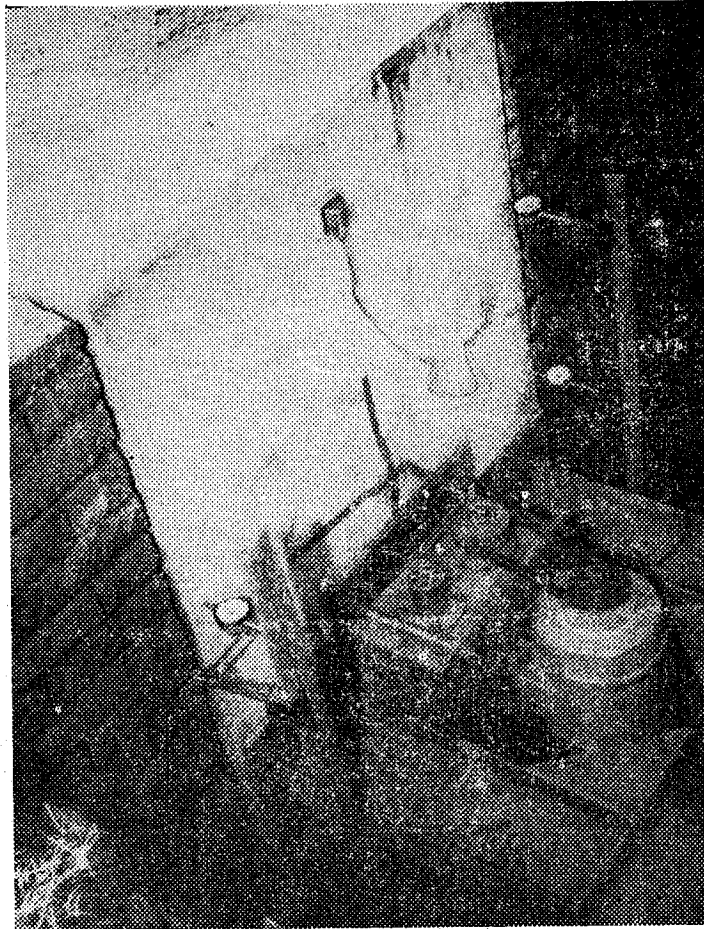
Test wall during the passive pressure test at site pp_1 .
